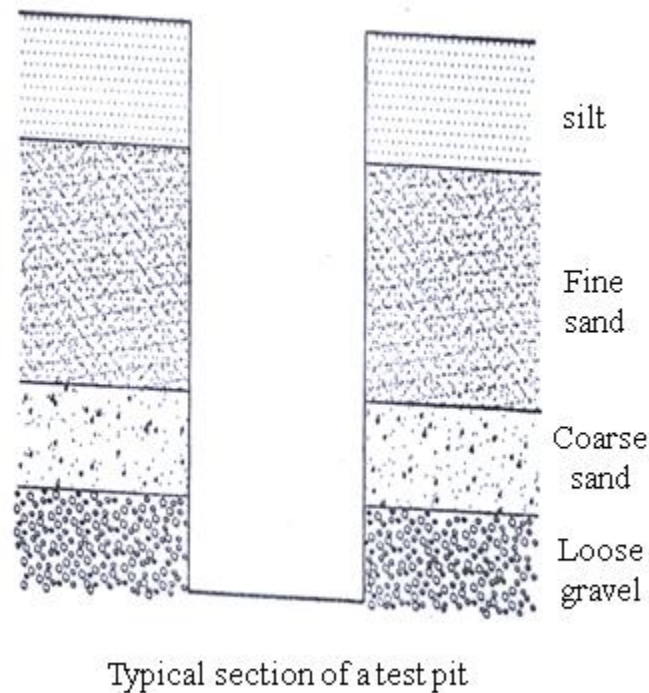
Open Excavation (Open Trial Pit)
